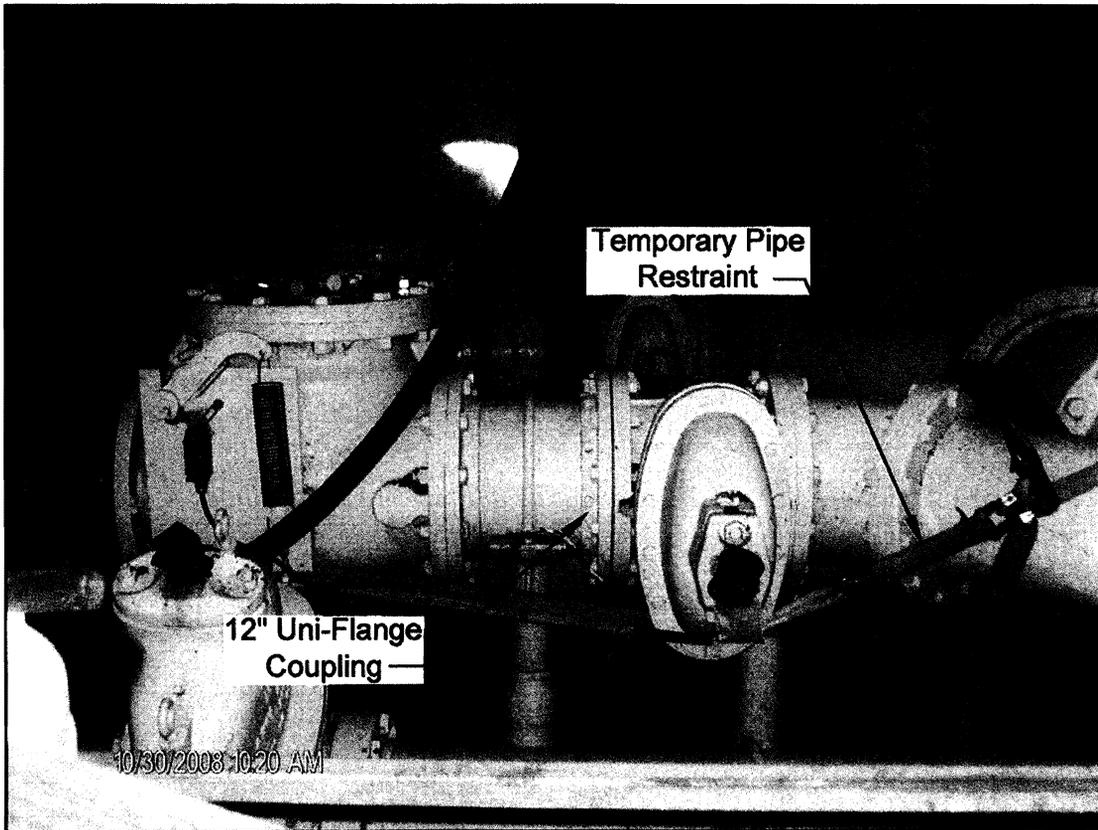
Pump #2 Uni-Flange Coupling on Pump #2
